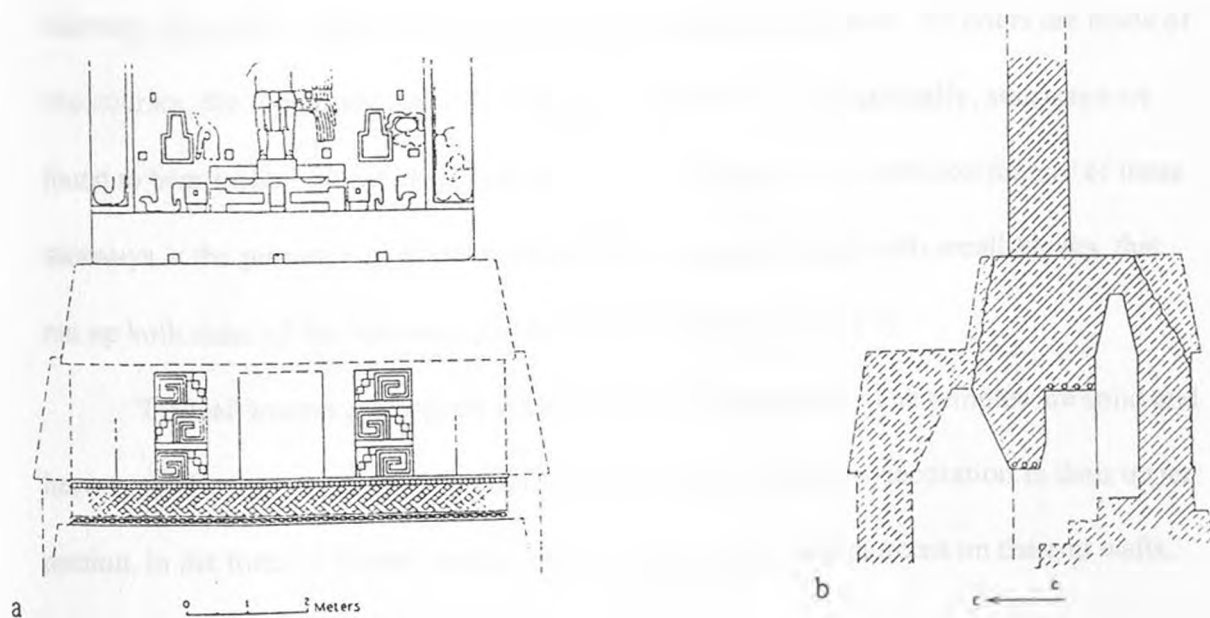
Okolhuitz, Str. I- a) west elevation, b) section (Ruppert and Denison 1943: figs. 103a,b).
